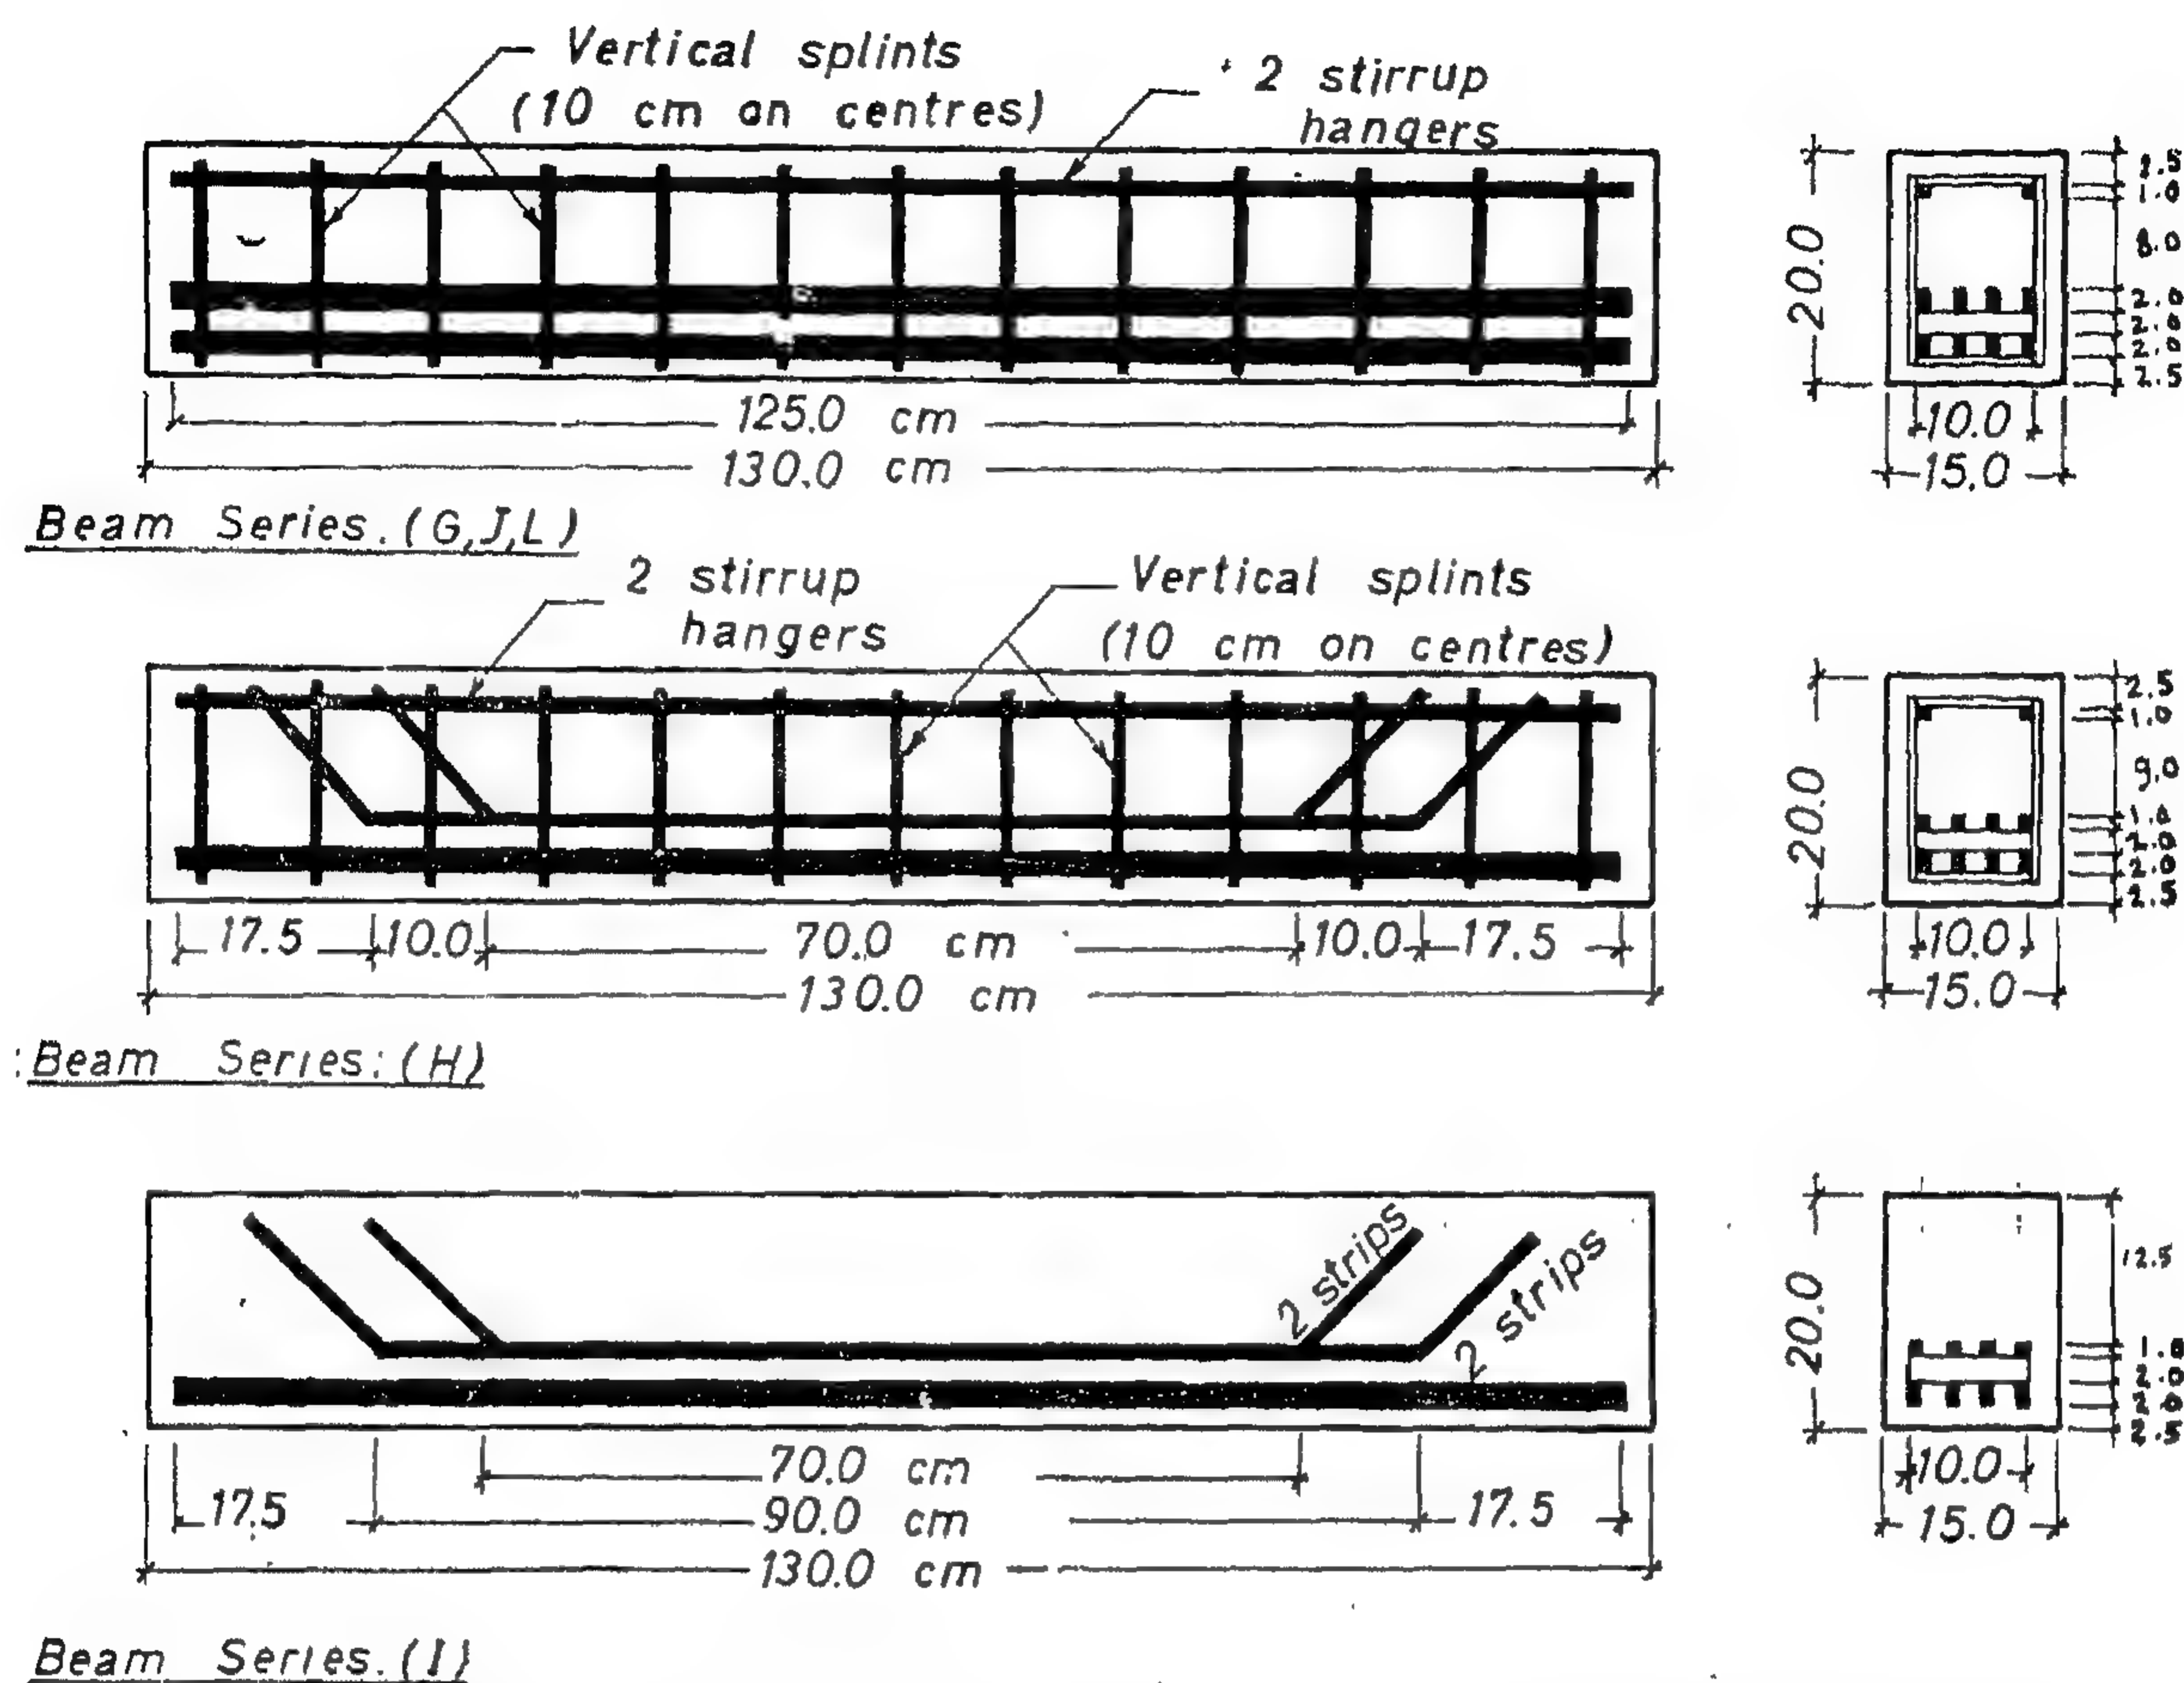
Rectangular Concrete Beams (15 × 20 × 130 cm) Reinforced with Bamboo.
